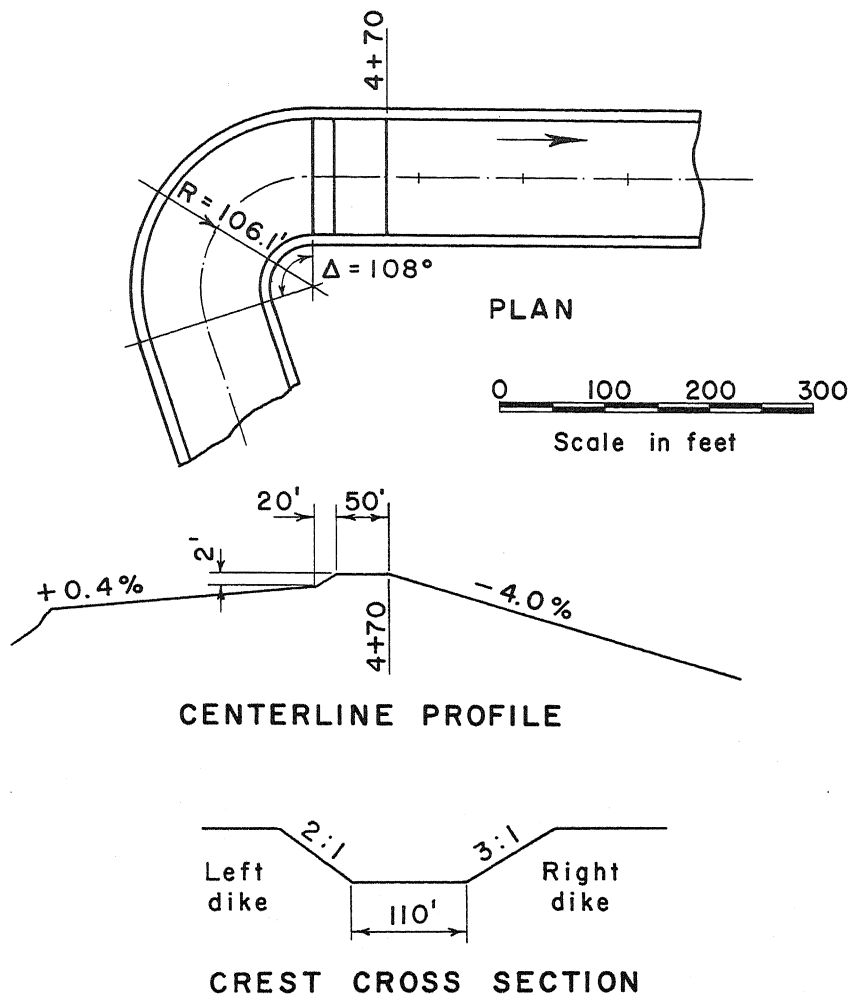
Dimensions of emergency spillway for floodwater-retarding dam.
